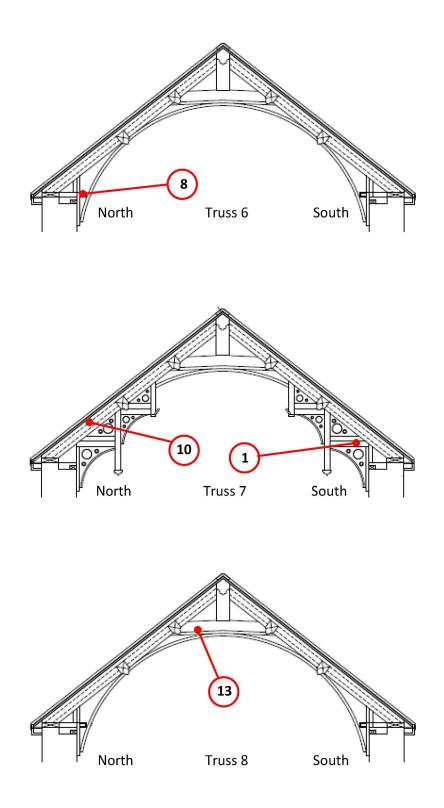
f: Sections through the nave roof trusses to locate sampled timbers
